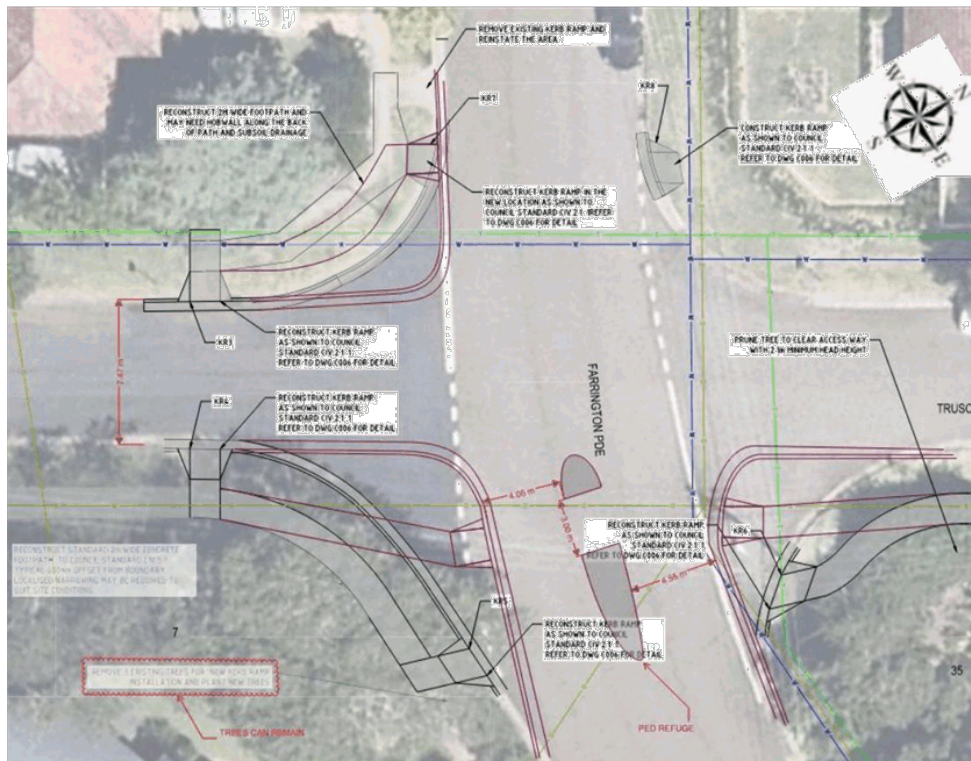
Concept design of a pedestrian refuge and kerb realignment, Farrington Parade and Truscott Street.
